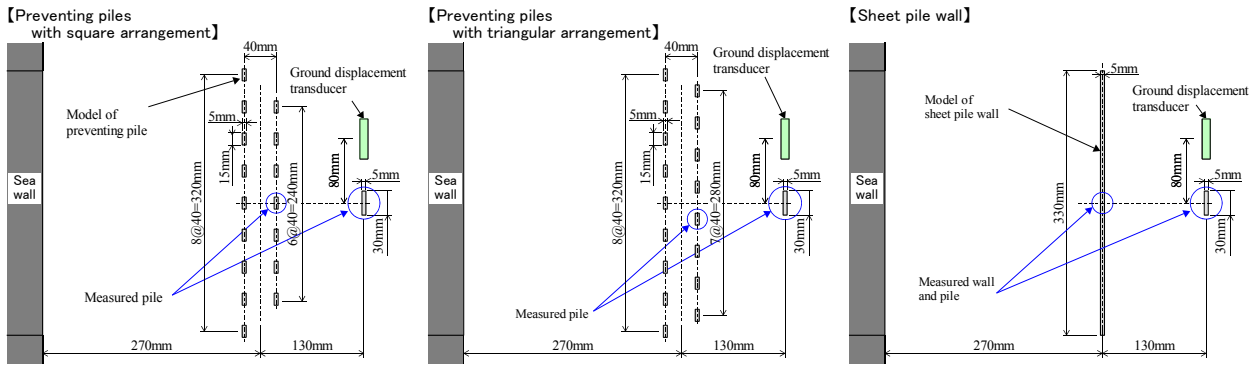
Schematic diagram of model the preventing piles and sheet pile wall.
